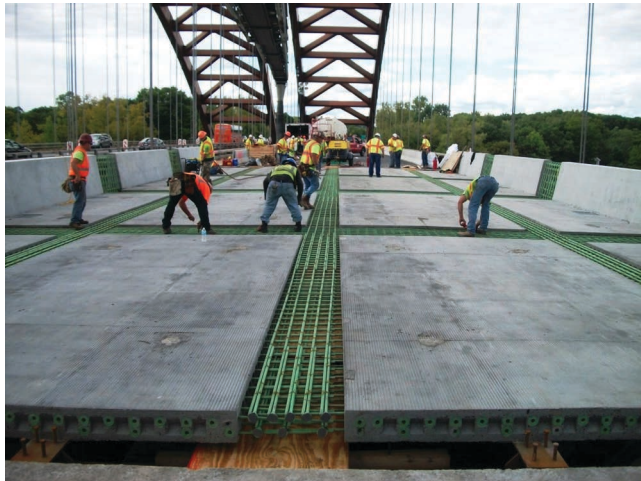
Precast concrete deck panels [Photo courtesy of NYSDOT].
